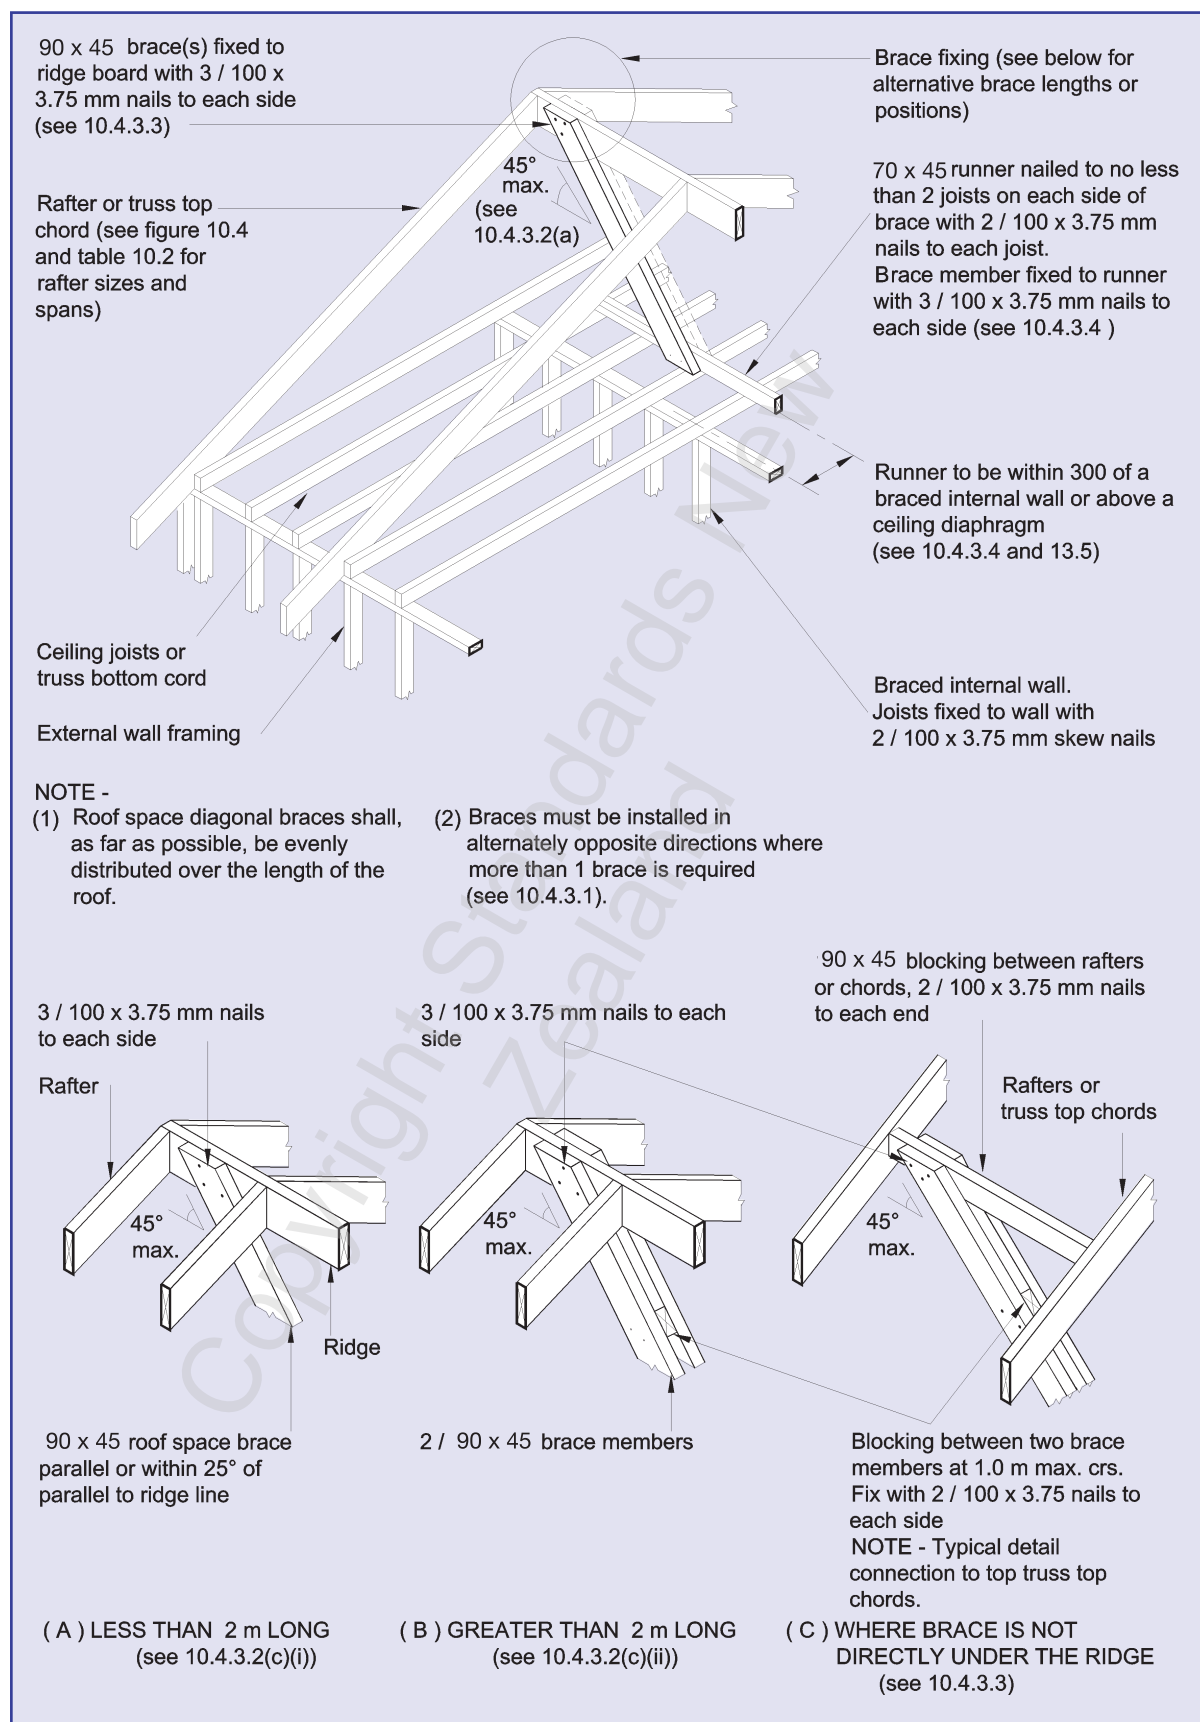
Roof space diagonal brace – Alternative fixings (see 10.4.3)
